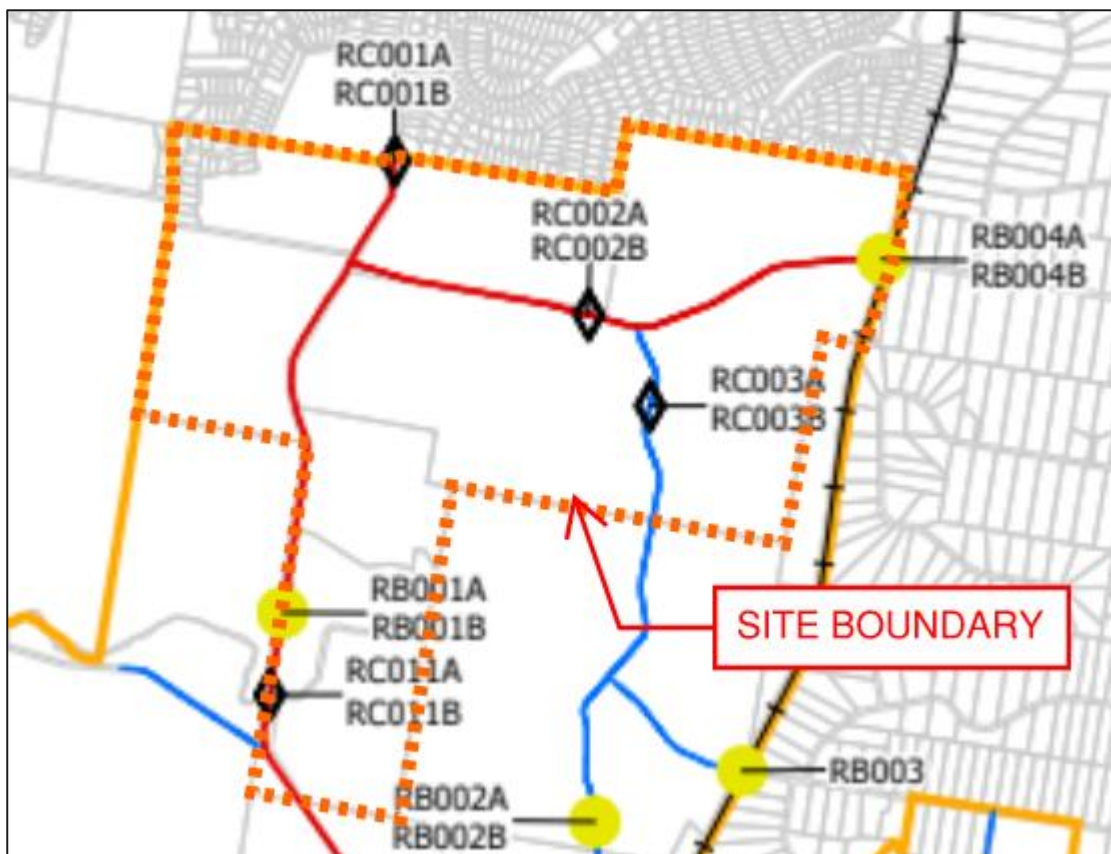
Extract from Bridges and Culverts Greater Flagstone Infrastructure Plan (Courtesy EDQ)
